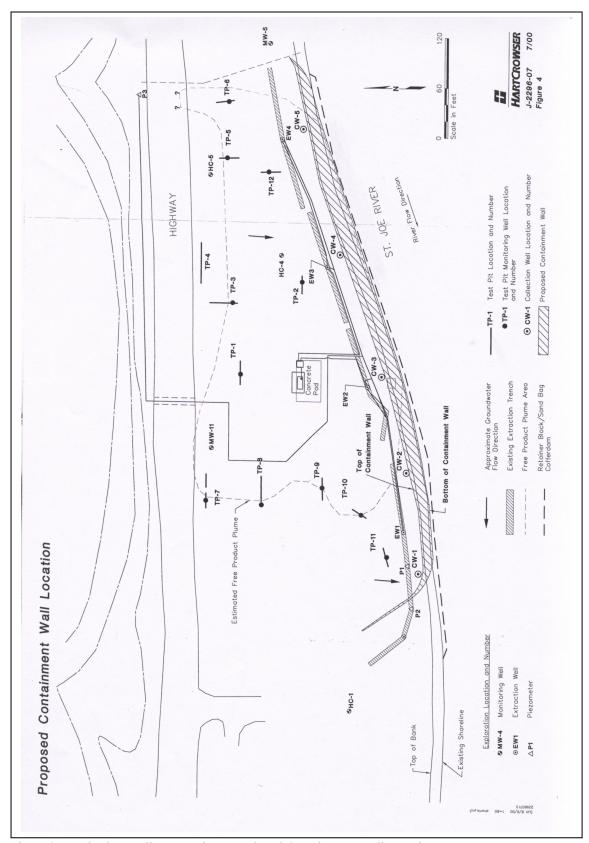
Monitoring Well, Excavation Trench and Containment Wall Location Map
